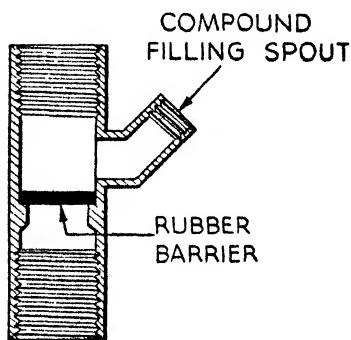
ARRANGEMENT OF CONDUIT SEALING COUPLING (SECTIONAL VIEW)
